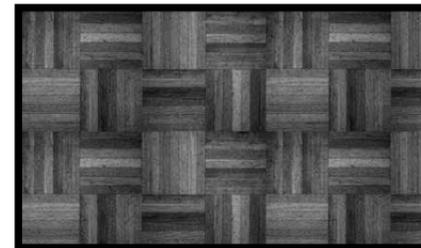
Make sure that the supporting material is sound and firmly fixed. Remove all residues of oil, paint, grease and wax by sandpapering the surface.
